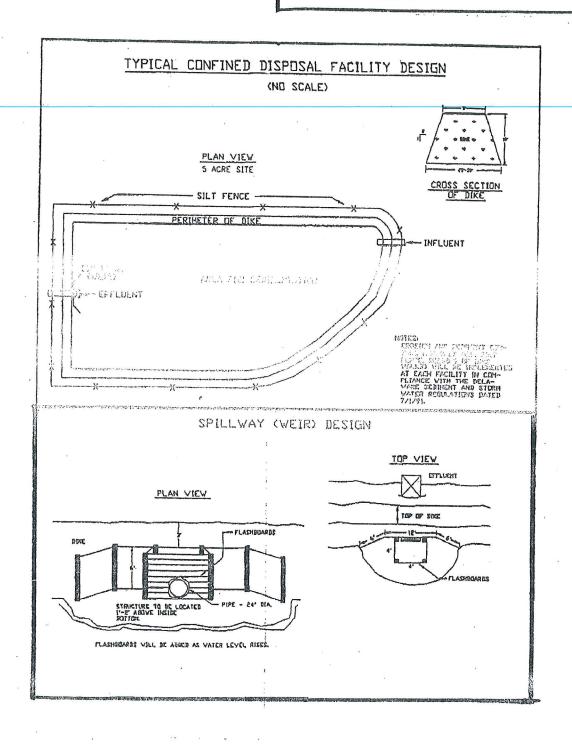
Plan view and cross-section of Confined Disposal Facility (provided by DNREC Shoreline and Waterway Management Section).
